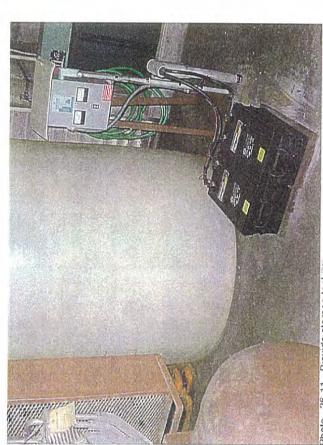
Interior Concrete and Electrical Panels Bluebird2.jpg 12/12/2002 (Thu), 1:38 PM
